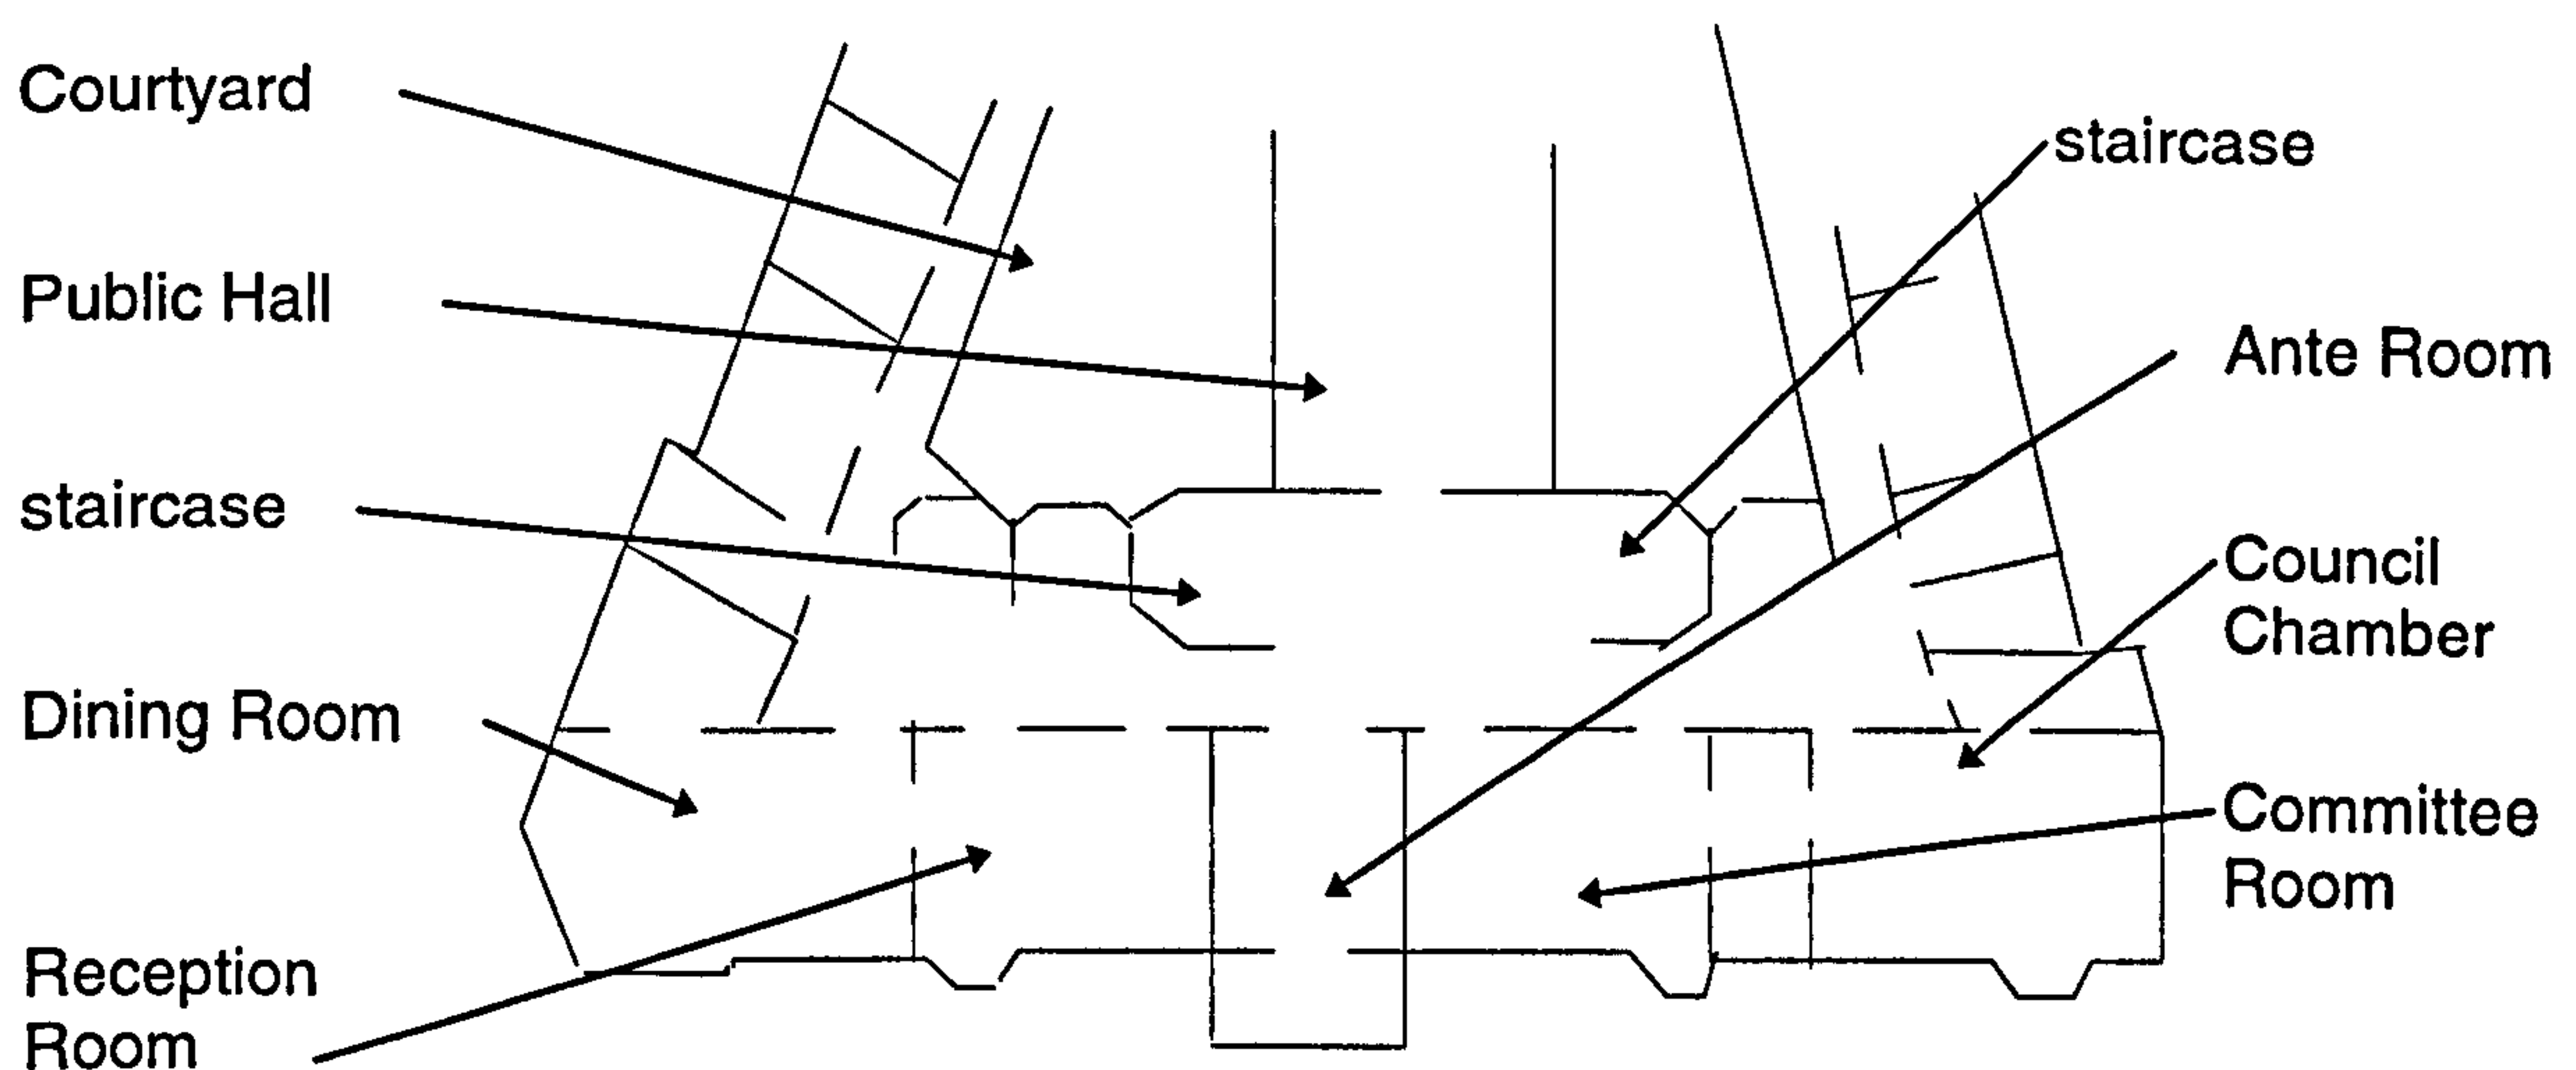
The Public Hall, Manchester Town Hall (source: The Builder, 1868).
